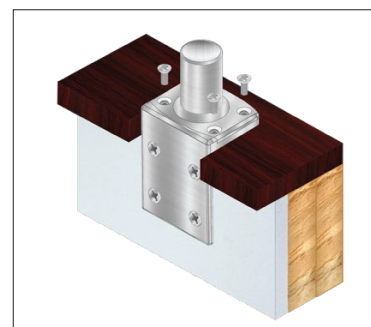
Figure S. (Right) Attach Rail Mounting Base with four (4) 5/16" x 1/2" machine screws.
